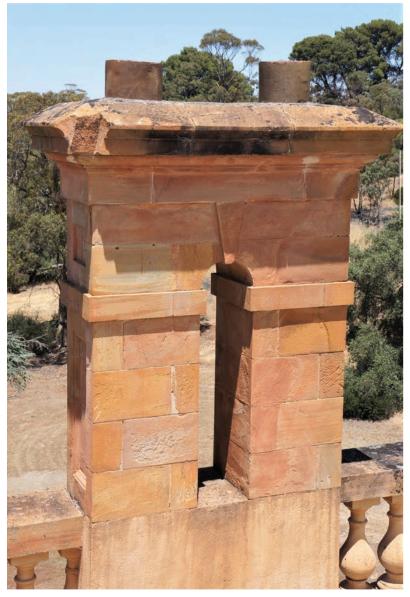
Chimney above the Housekeeper's Bedroom on the west elevation. Note the missing corner to the capping. There are a range of plastic repairs and different coatings. Note also the render below parapet level that has cracks in its surface. This chimney is in better condition than most.
